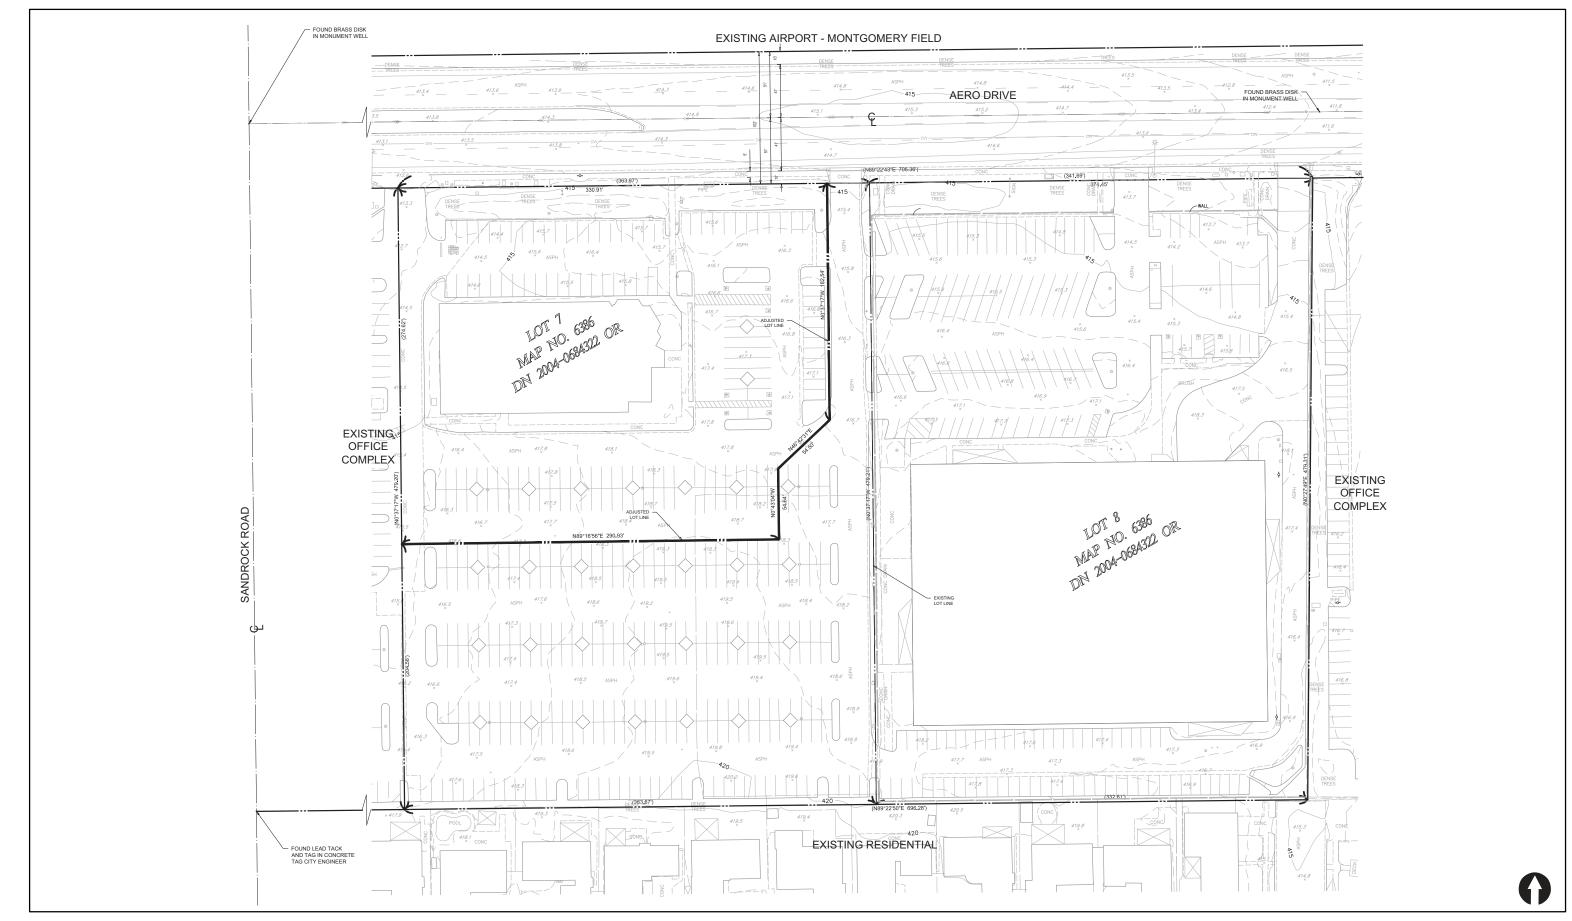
shows the existing site plan and Figure 2-4 shows the proposed conceptual site plan.
